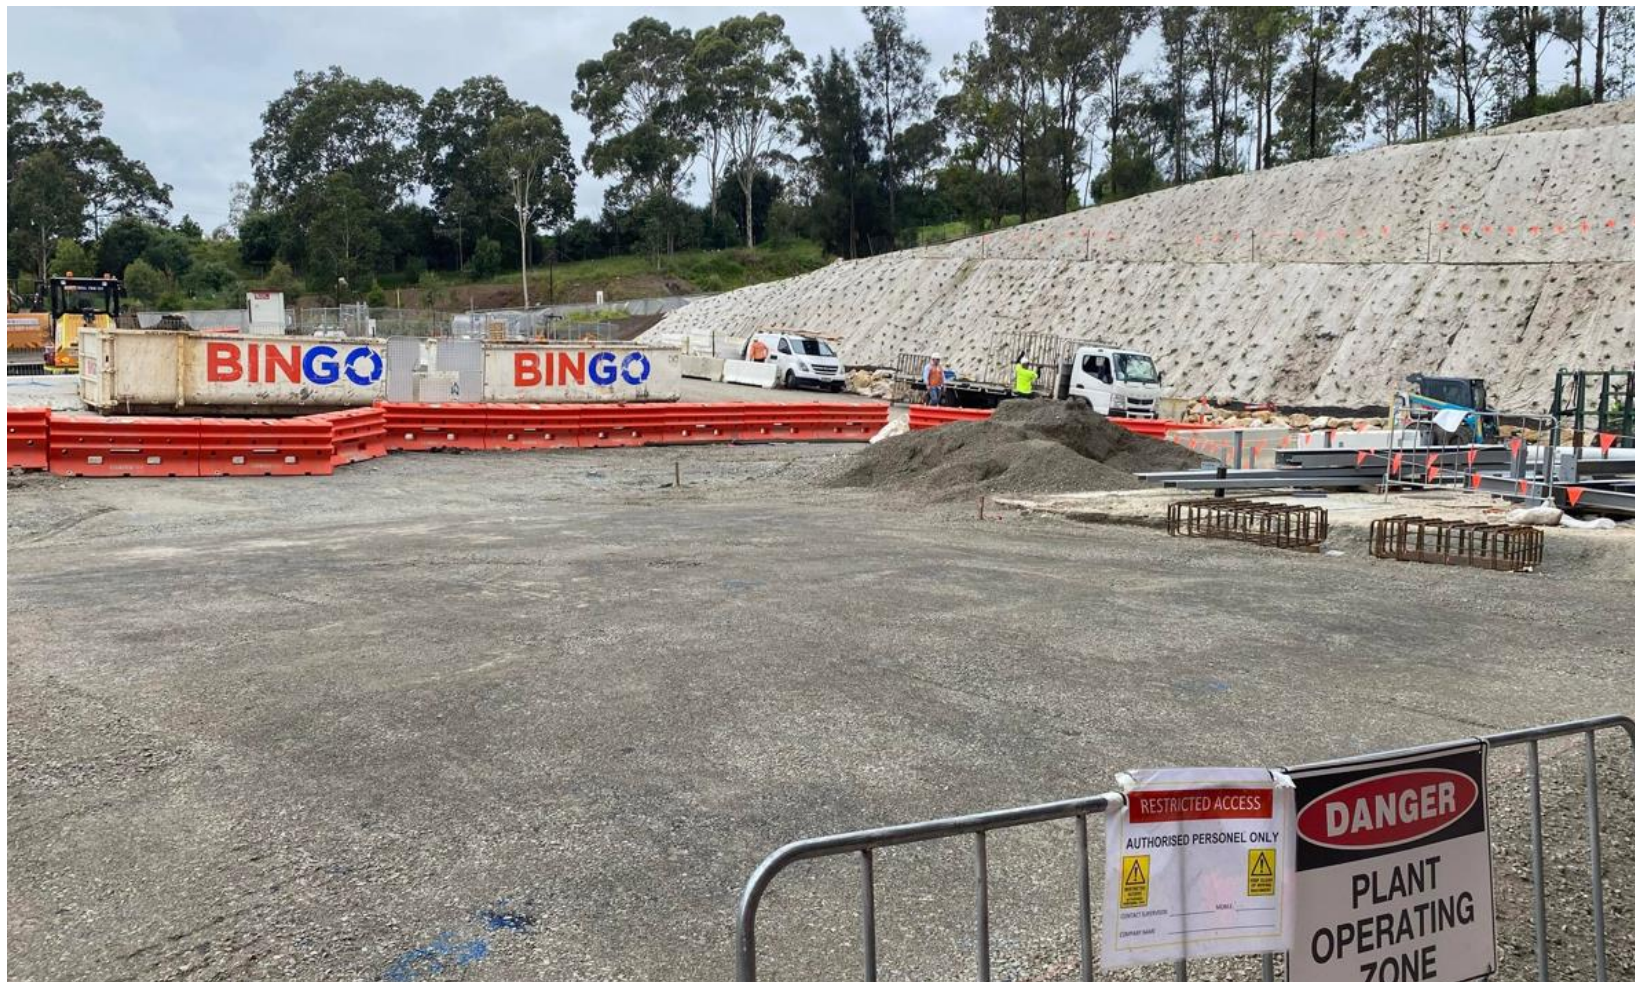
CoC C25– Stabilised ground surface, stabilised and vegetated batters
